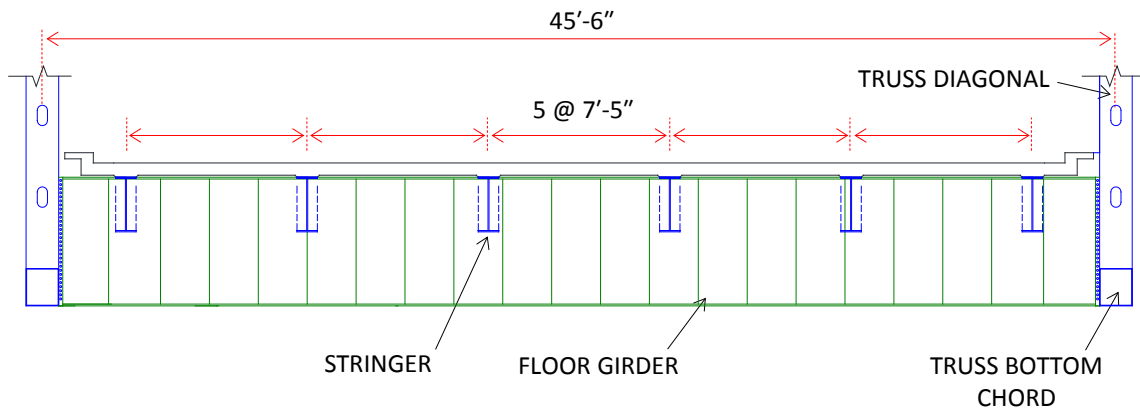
Dimensioned cross-section view of the northbound I-5 Columbia River Bridge constructed in 1916.
